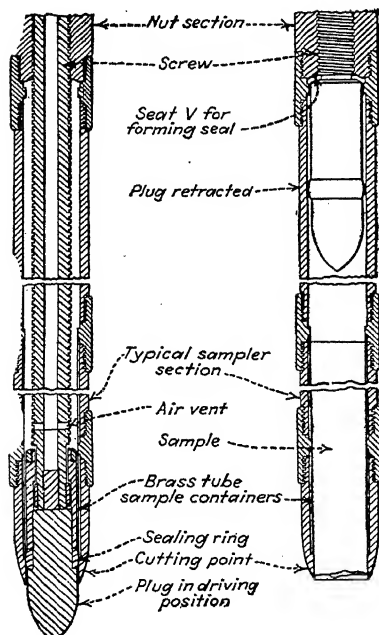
Lower end of Porter soil sampler. *Jacoby and Davis, "Foundations of Bridges and Buildings," 3d ed.
